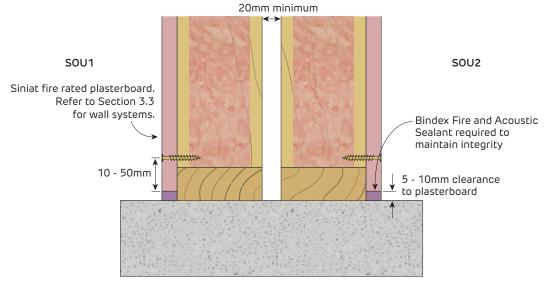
Separating Wall Base to Slab FRL 60/60/60 Section
